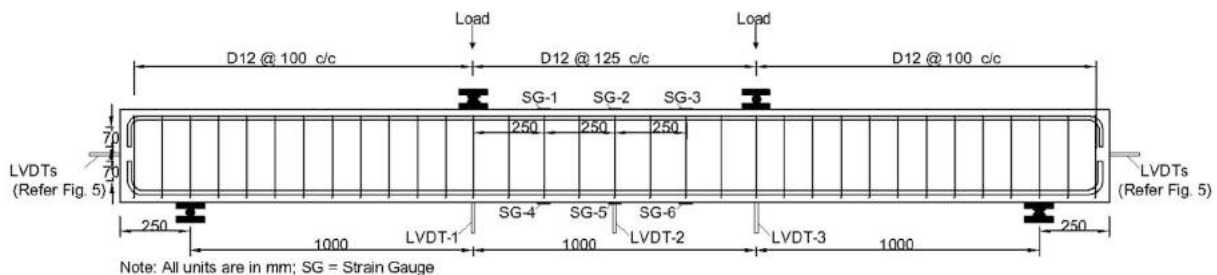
Longitudinal section of RC beam, instrumentation, loading and support details.
